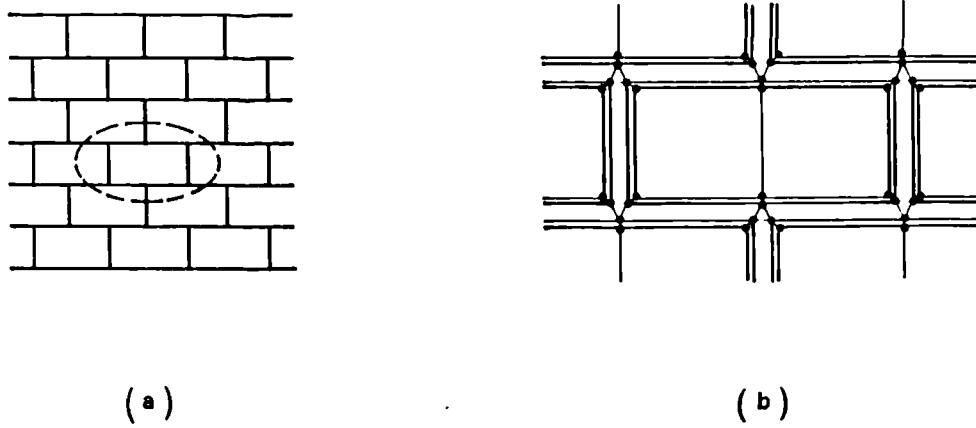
Masonry 3.D Finite Element Subdivision;
